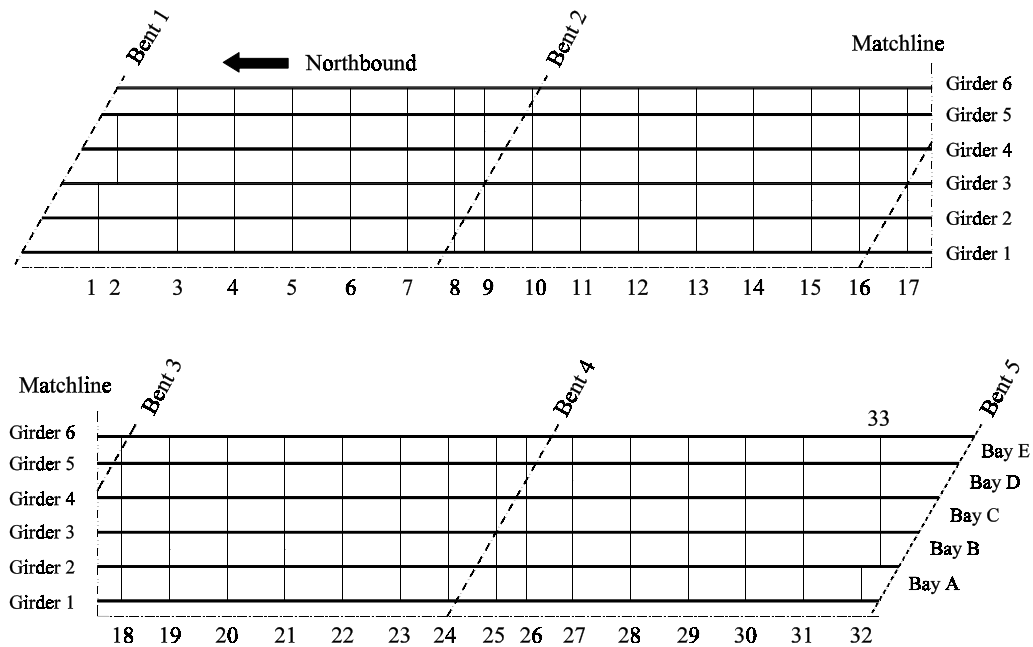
Framing plan of 134.2 m (440 ft) unit.
